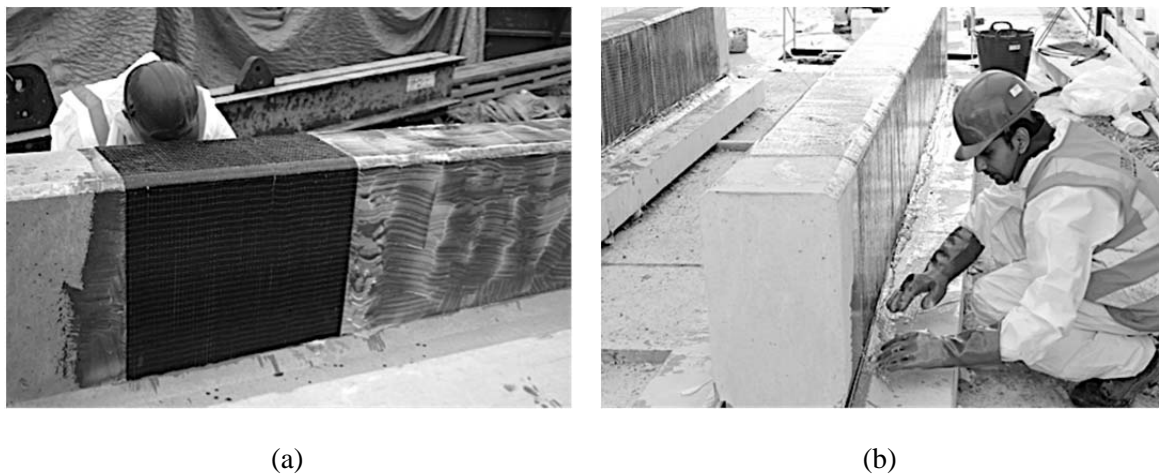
Large T-beam strengthening with externally bonded CFRP sheets: (a) CFRP sheet application onto primed concrete surfaces, (b) bar-in-slot anchorage application.
